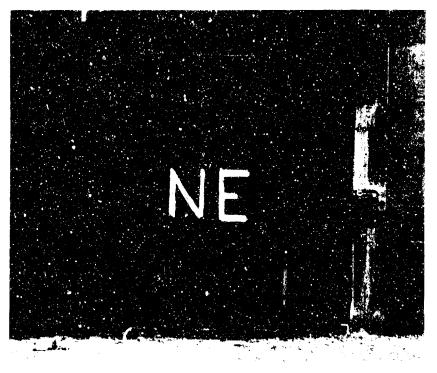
Post Test View of Leton B Door Showing Detormation. (New LHE 189065).
